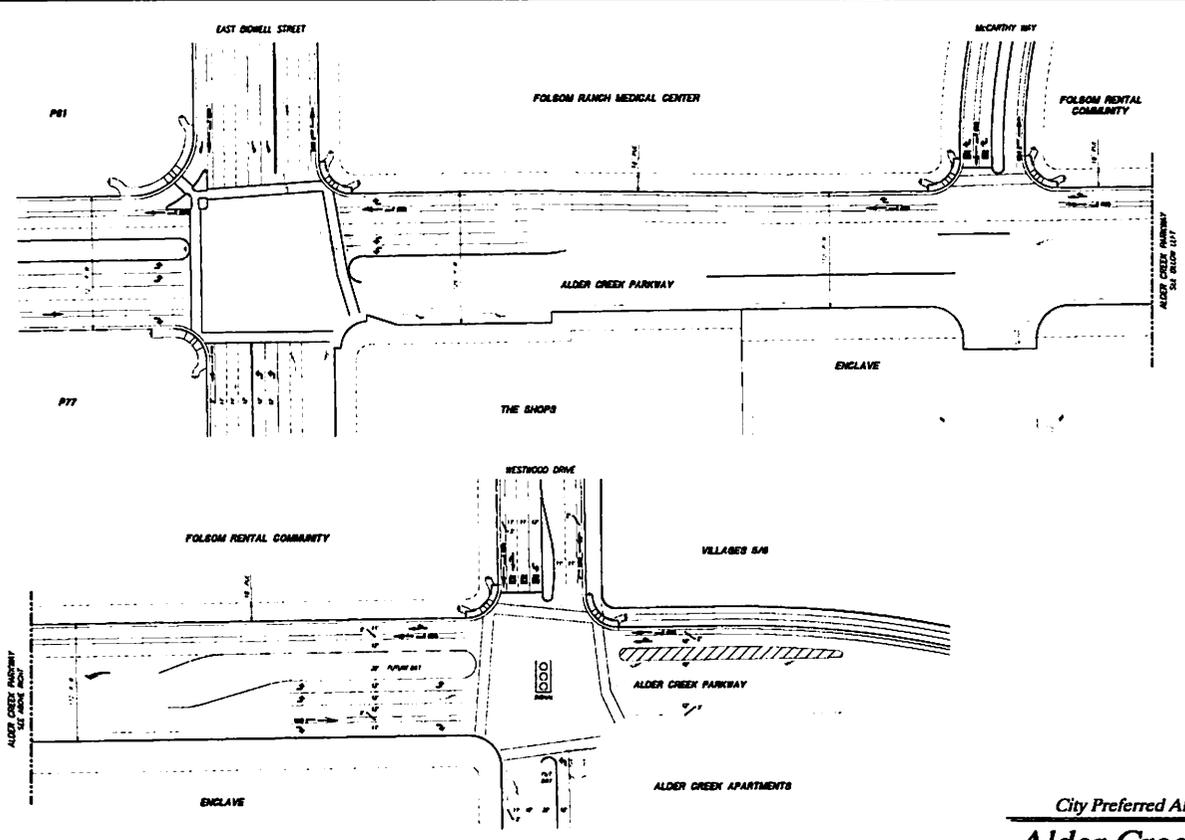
Ultimate Striping Plan (City's Preferred Alternative)
